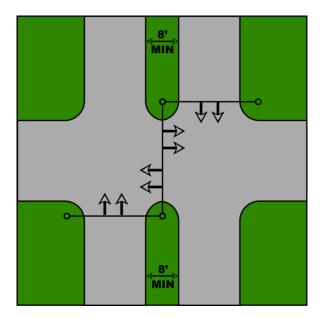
Span Wire Arrangement: Z Span with Curbed Median
